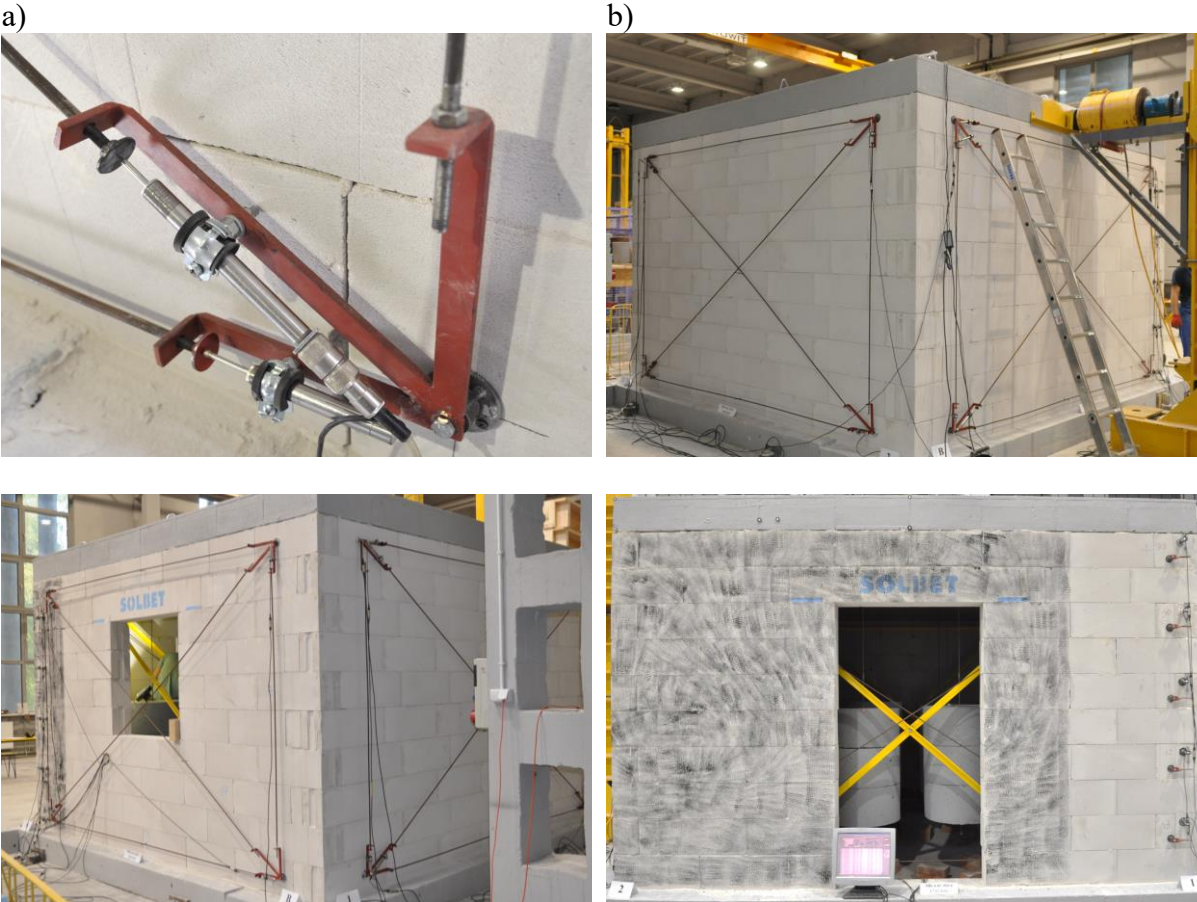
Measuring bases: a) corner detail with LVDT – PJX-20, b) measuring frame bases, c) measuring frame on the wall with the window opening, d) measuring frame inside the building (wall analyzed by the GOM system)
